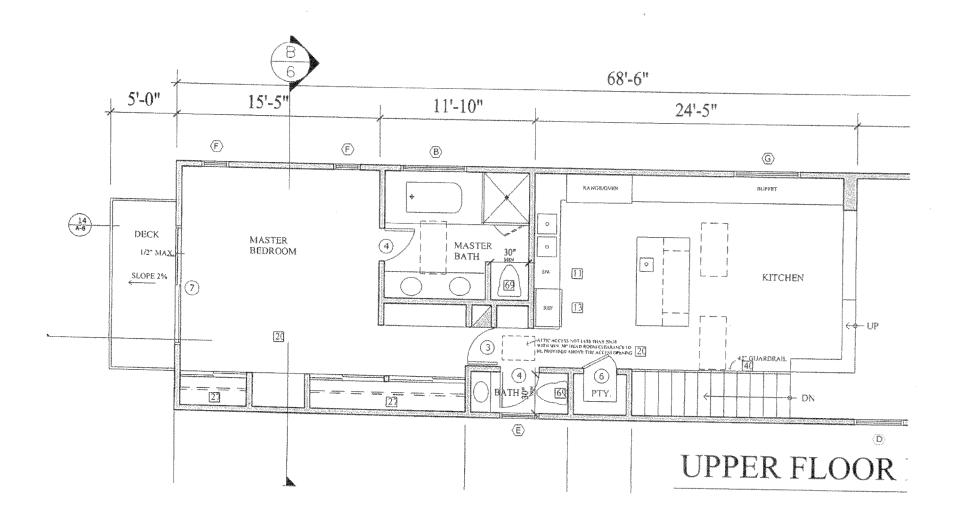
Exhibit I – Building Department Engineer's Comments – 06/25/2010
